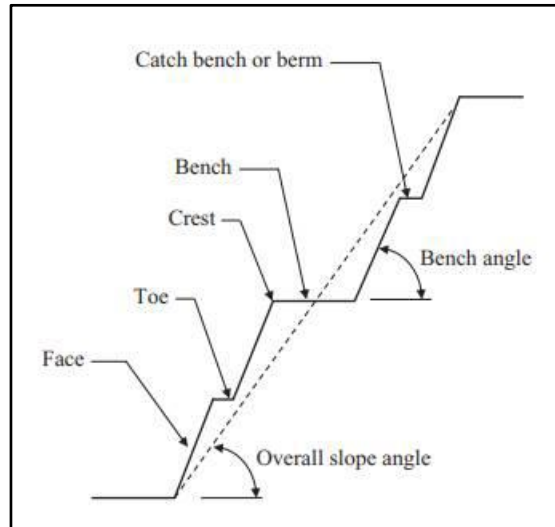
Schematic diagram of an open pit mine bench slope parameters (After Chaulya and Prasad, 2016)
